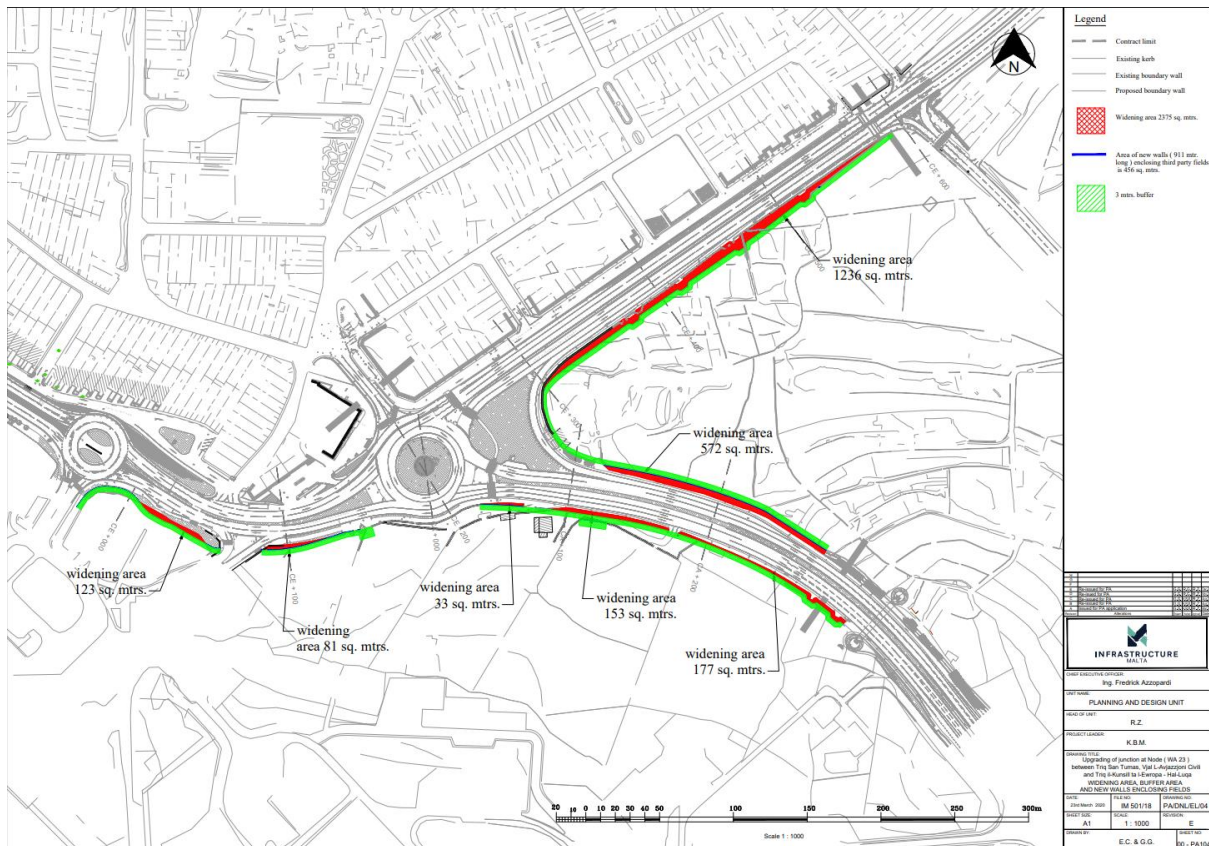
i: Proposed widening areas (red), new walls (blue) and buffer zone (green) (Source: PA/04721/20 – 78a on EApps)
